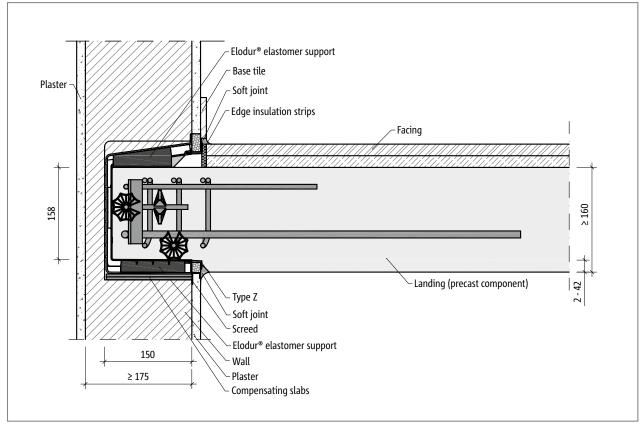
Schöck Tronsole® type Z-V+V-T: Installation cross-section precast landing
